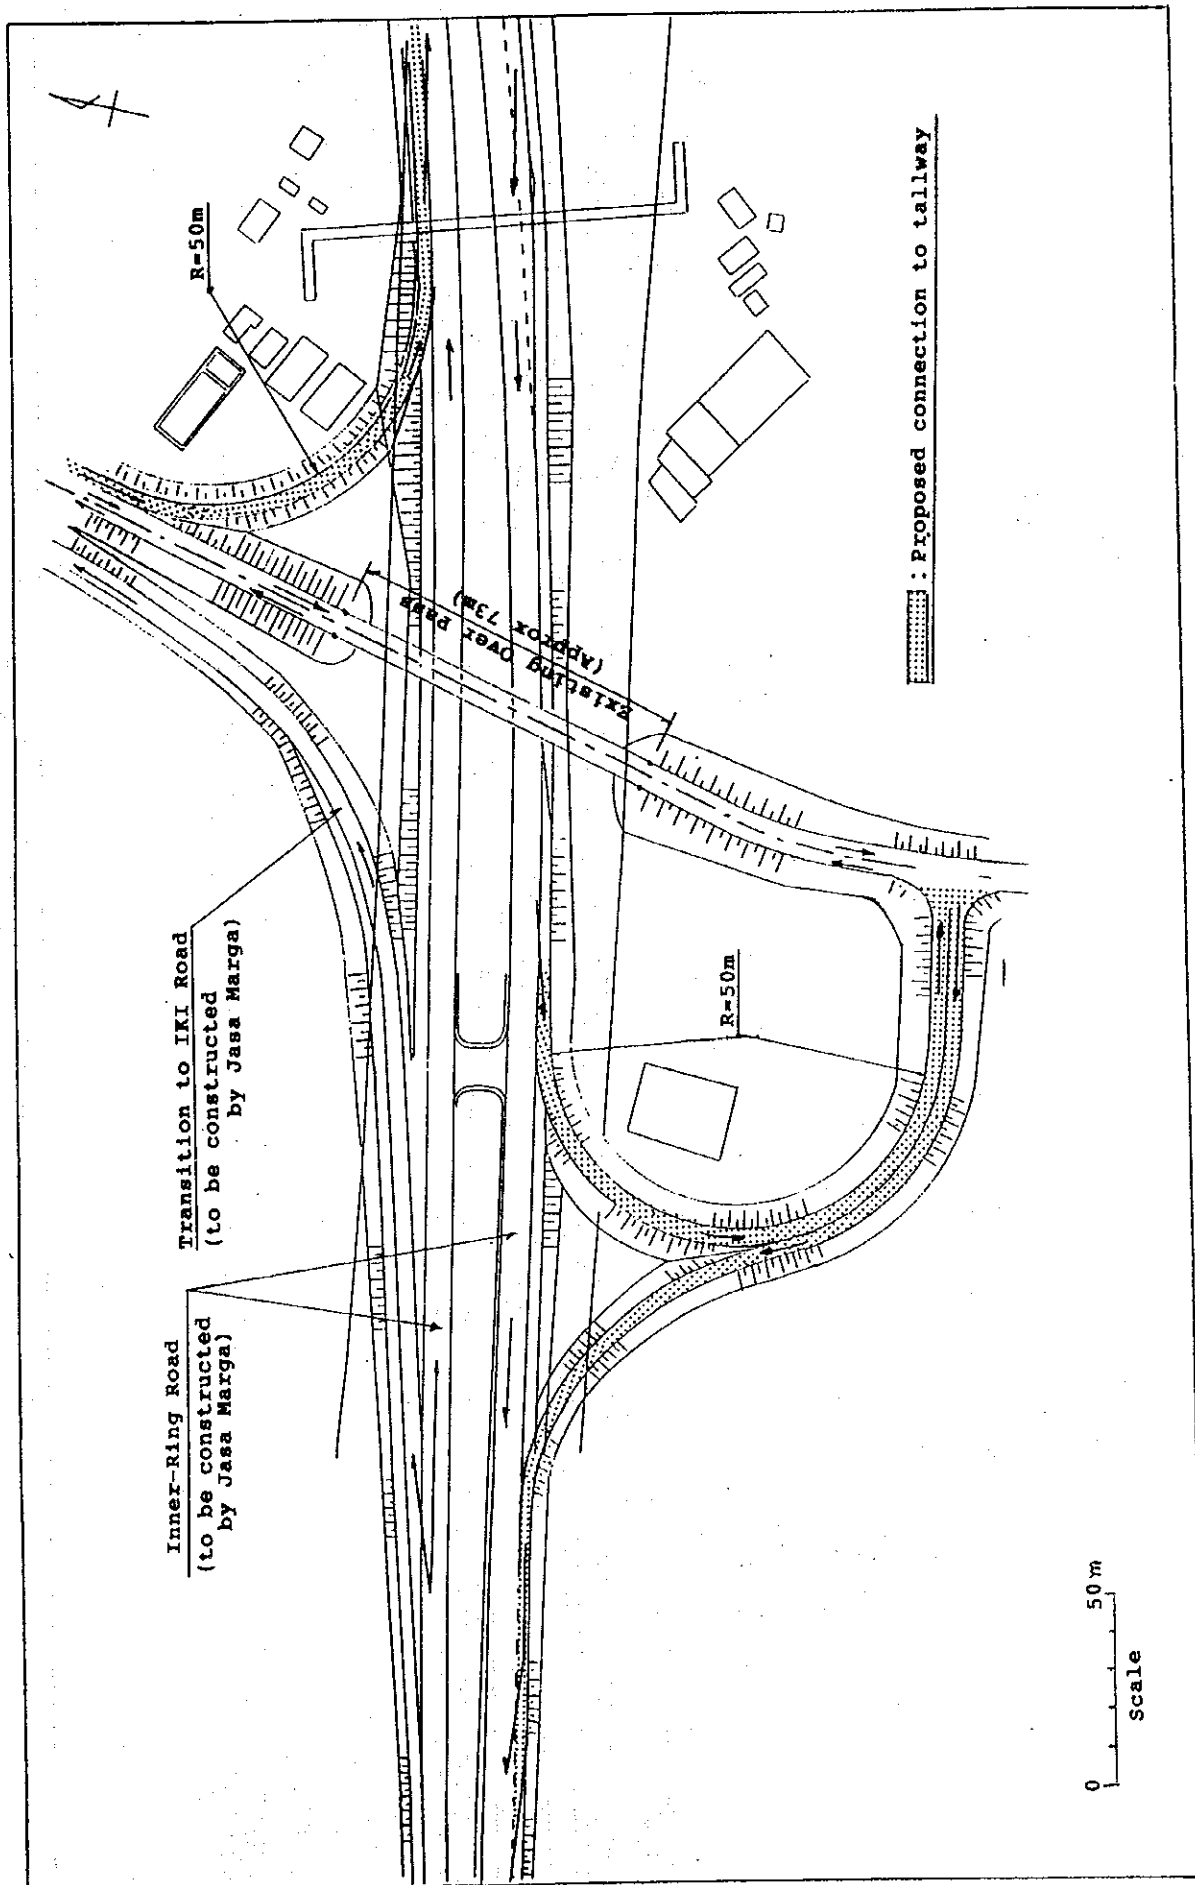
Arrangement of Interchange at Inner-Ring Road (1)
